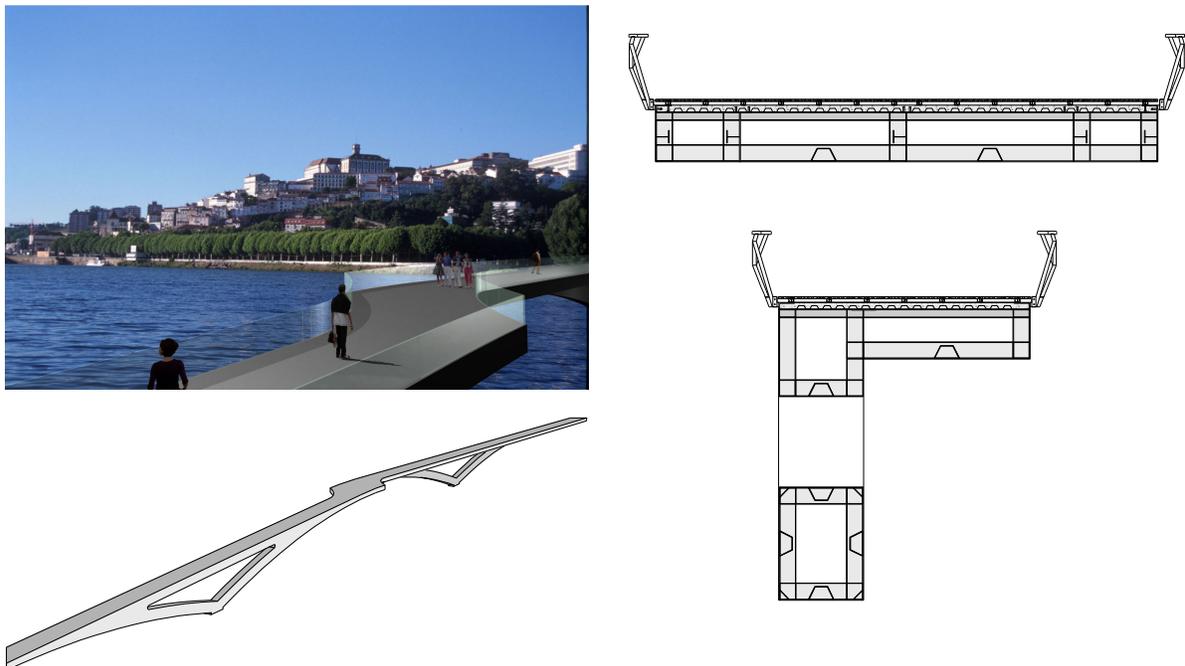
Perspectives of the footbridge. Cross-sections at mid-span and at in the proximity of the arch springs
